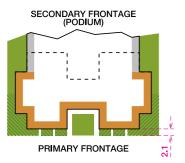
Plan diagram: Ground floor frontages with adjoining podium.
